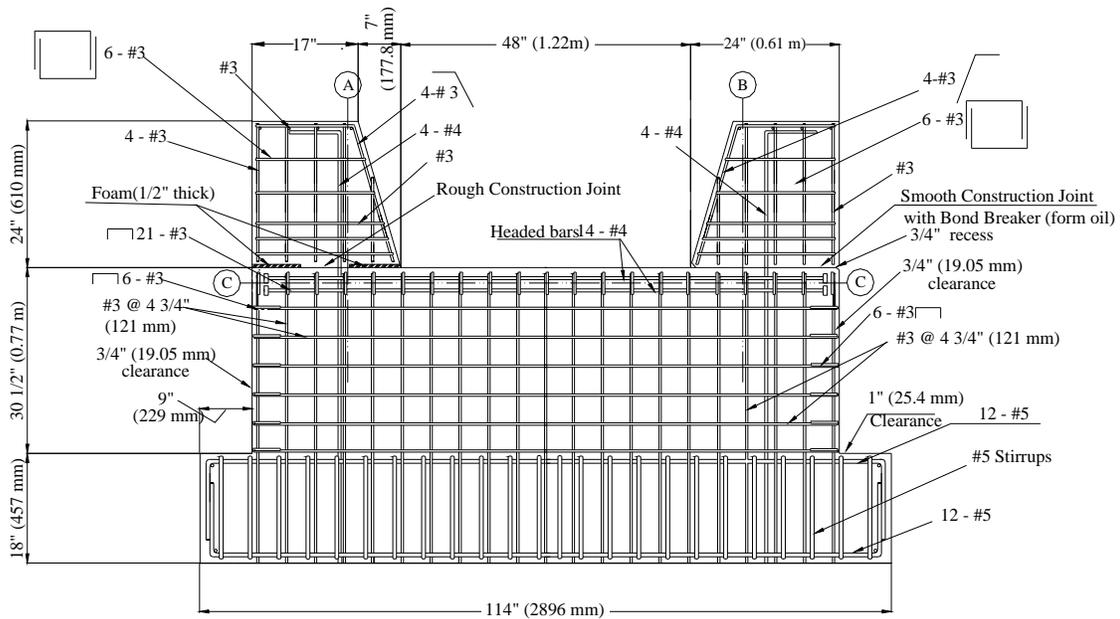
4- Elevation View of the Reinforcement Layout-Test Series V
